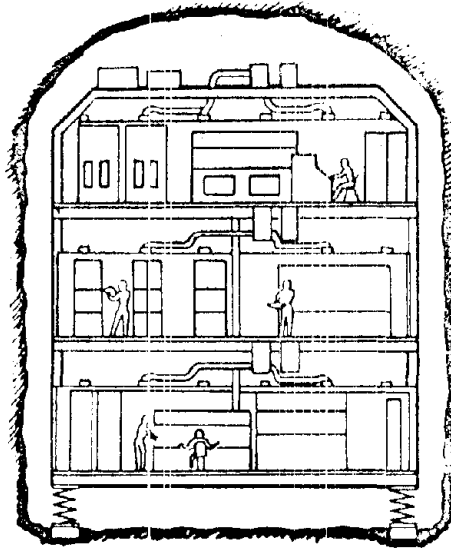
NORAD FACILITY - TYPICAL SECTION
